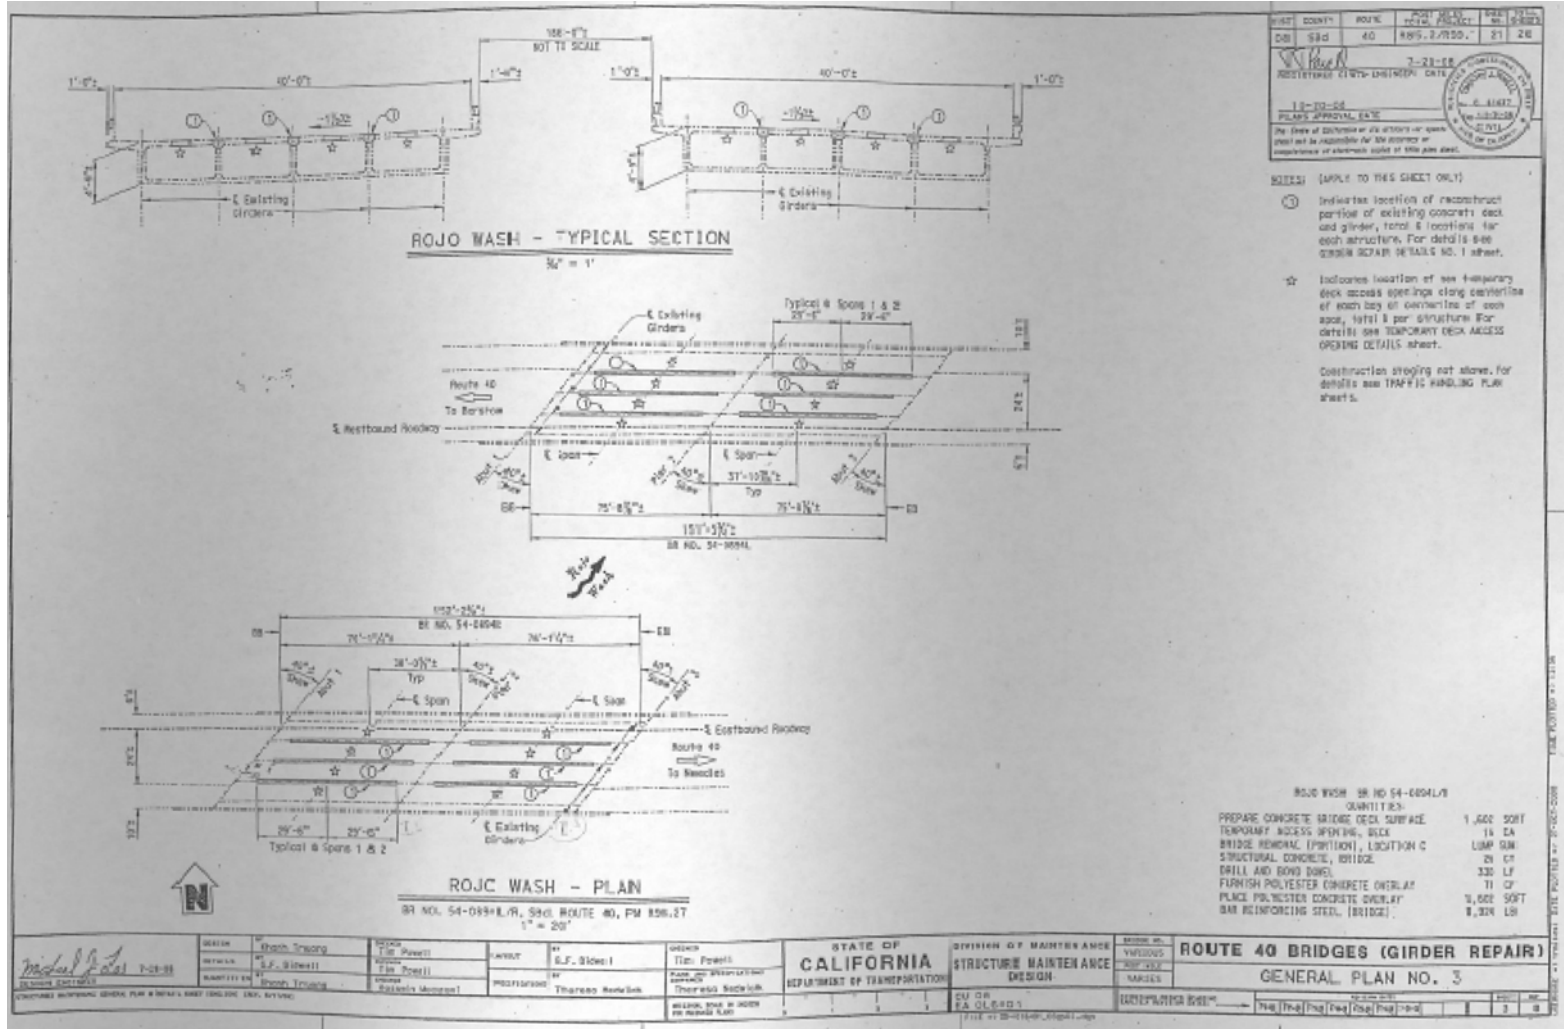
Typical section and plan for the Rojo Wash Bridges (Rt. and Lt.).
